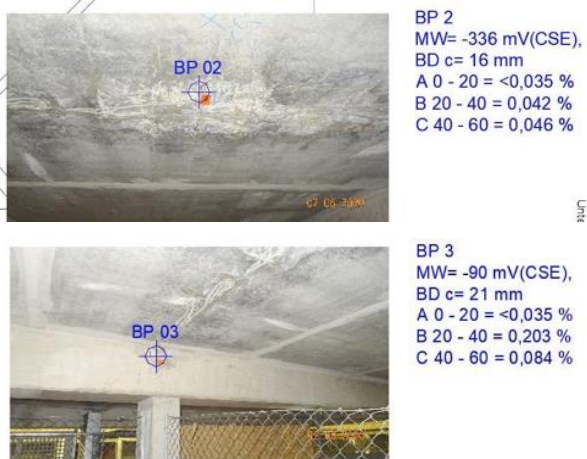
Potential Field Measurement Plan – Ceiling Underside
